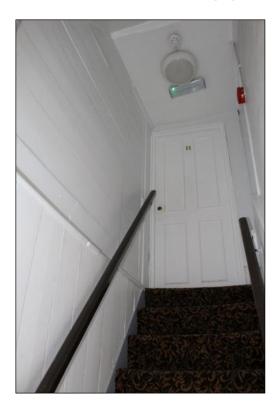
Stairs between the southern extent of the first floor and the second floor.
